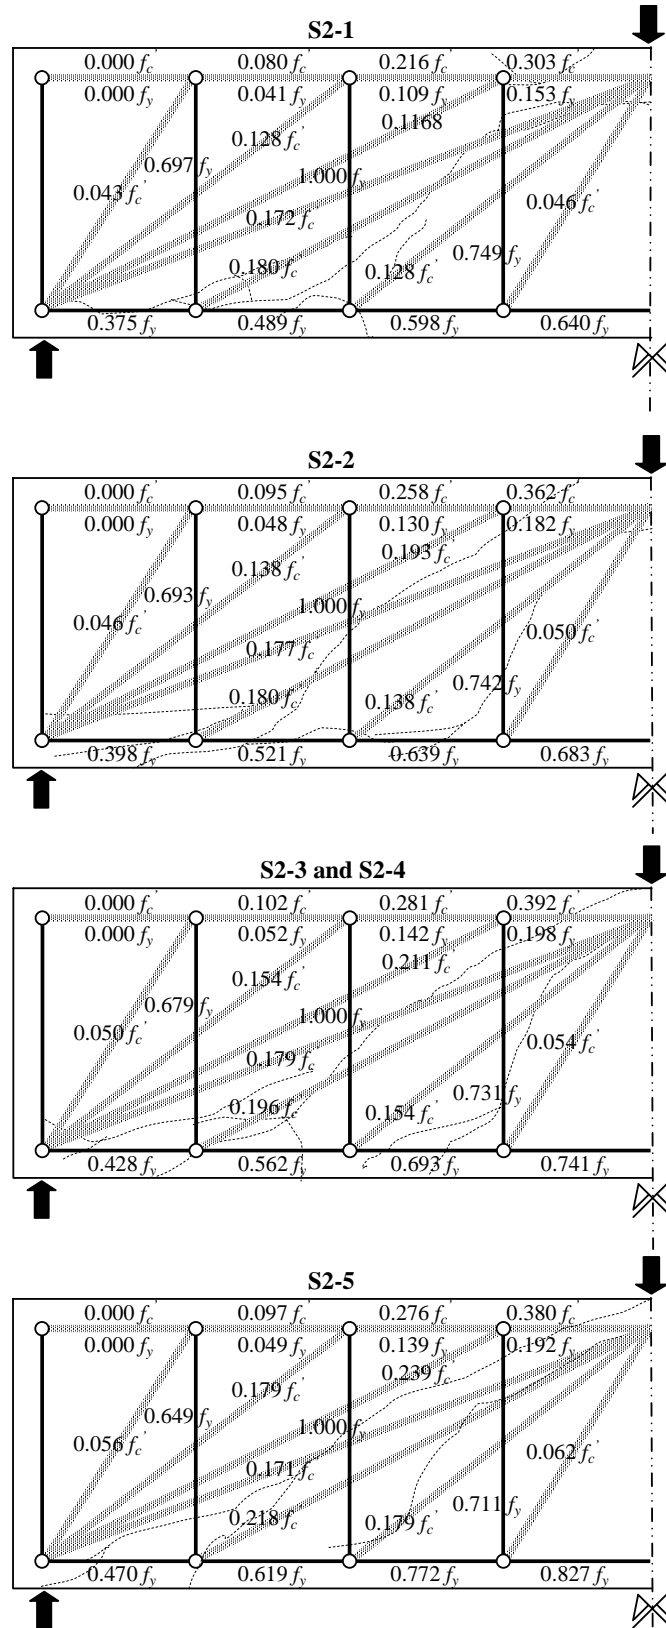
North shear span of the Series 2 beams with modified truss models
